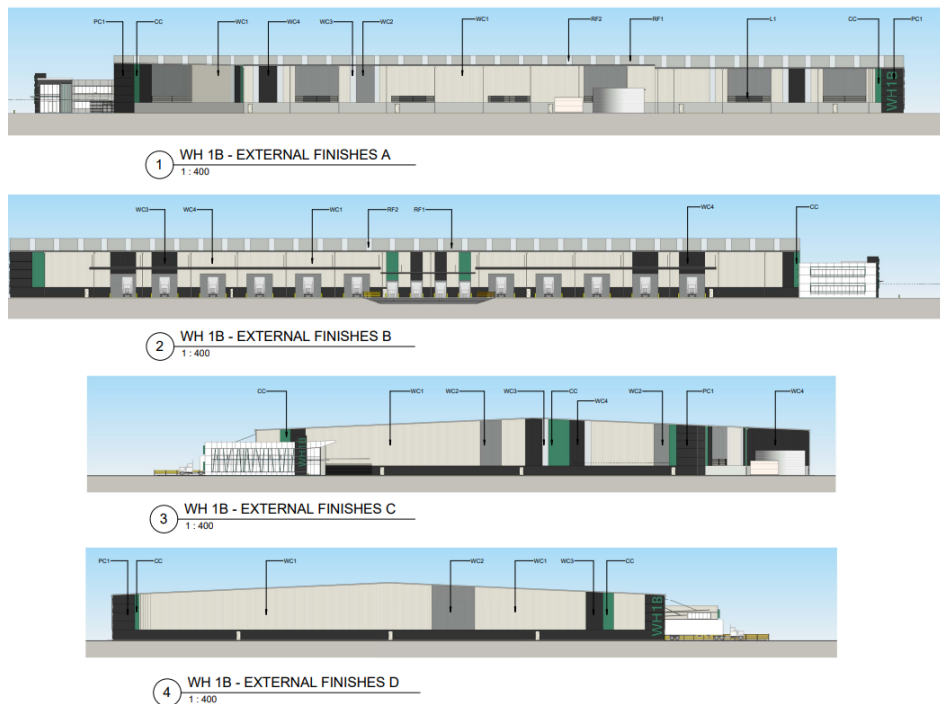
| Stage 2 Warehouse Elevations, Original Consent
